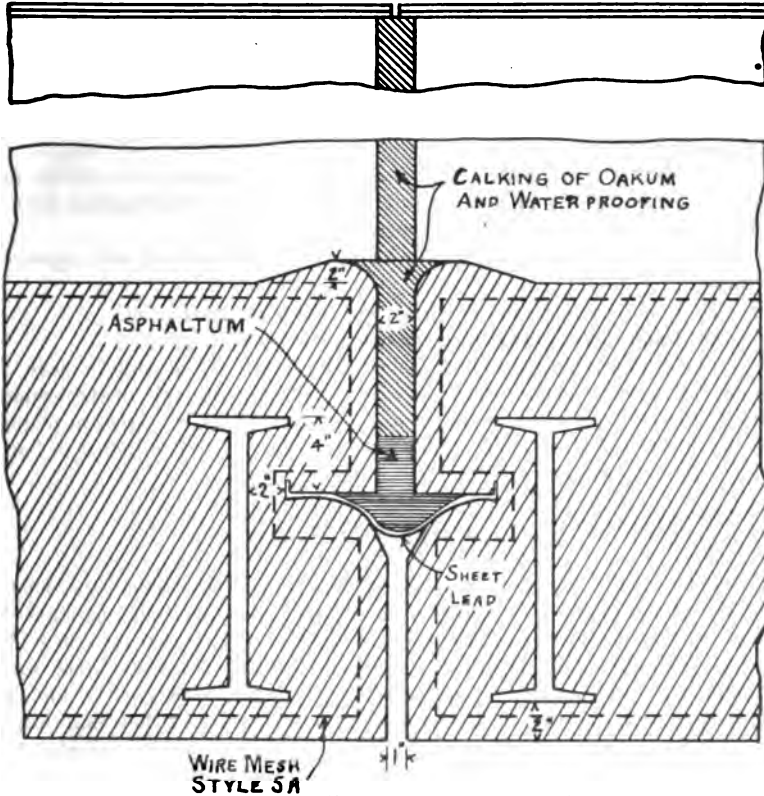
JOINT IN FLOOR SLAB FOR ARCH BRIDGE.
